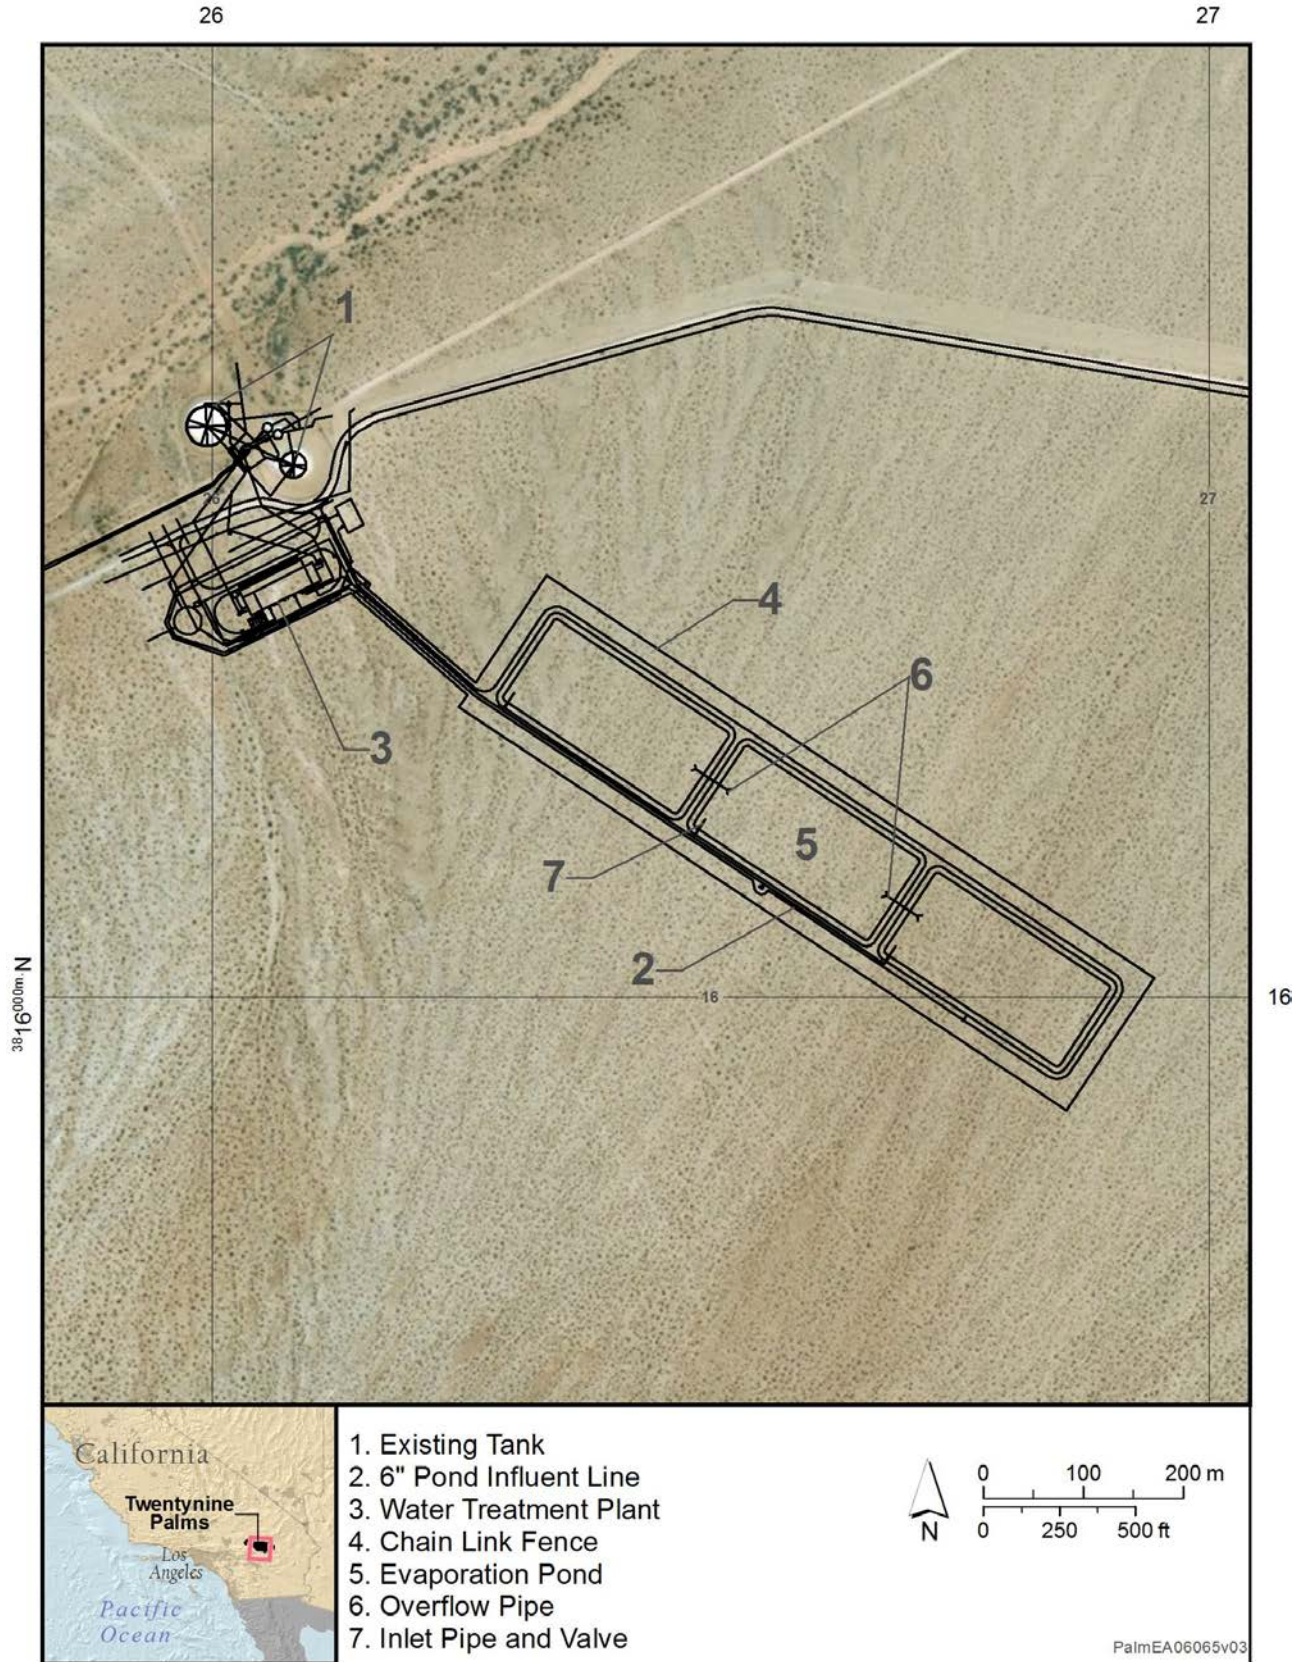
Notional Site Plan for the New Drinking Water Treatment Plant
